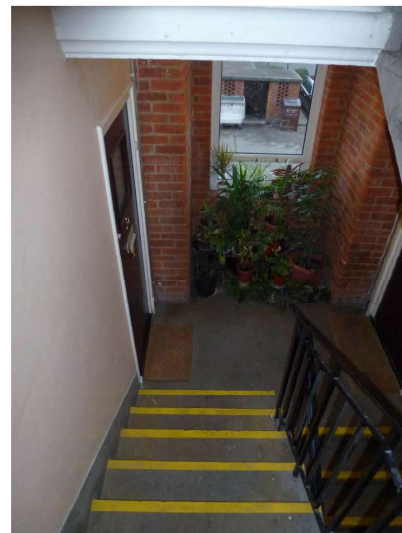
Internal communal staircase, concrete stair structure and painted metal balustrading
